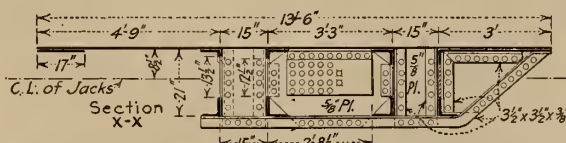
DETAILS OF DOUBLE ROOF SHIELD TO BE USED FOR TUNNEL UNDER N.Y.C. & H.R.R. JUST NORTH OF THE HARLEM RIVER
